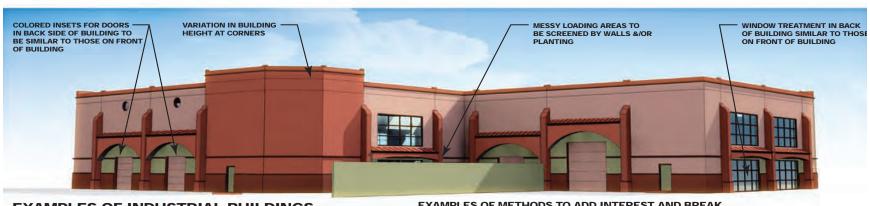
| Examples of Industrial Buildings - 1 Story Alt.3 Single Story - Color Alt. #3
